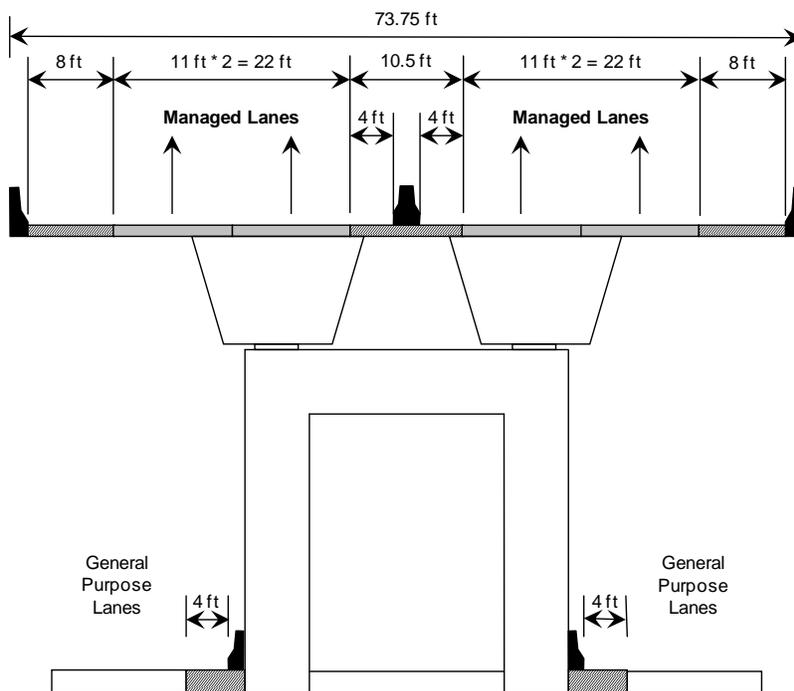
Bi-Directional Elevated Cross Sections–Dual Shaft Pier
